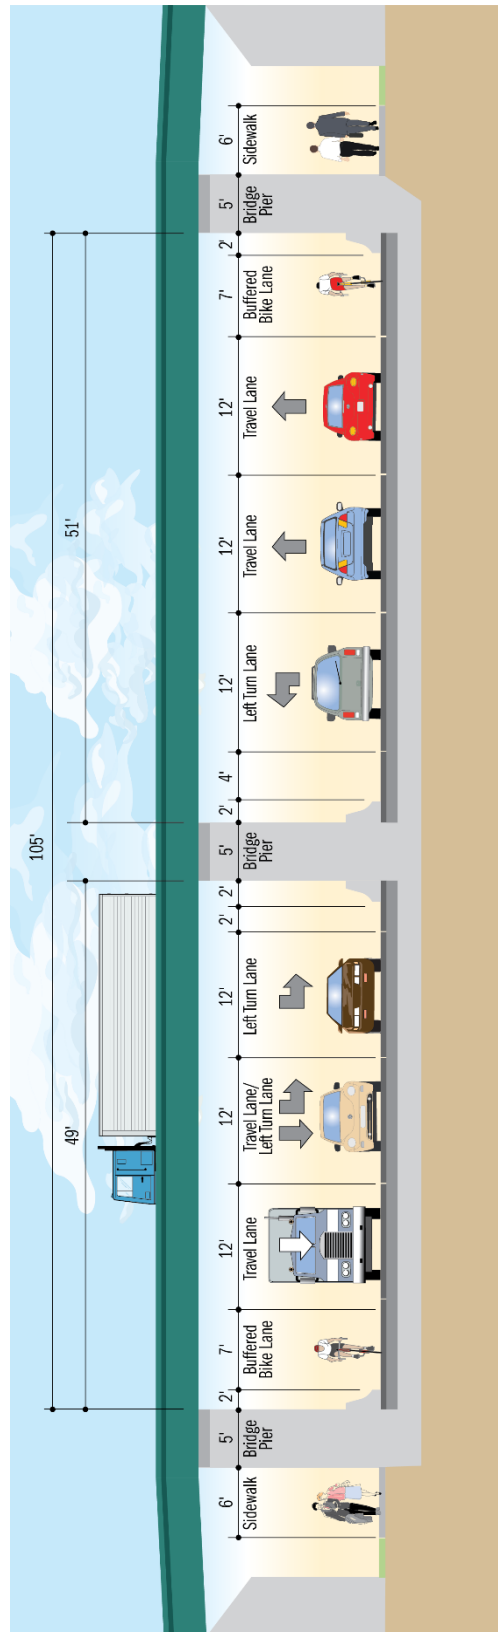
Segment 2 – N. Friday Road to Cox Road Typical Section
